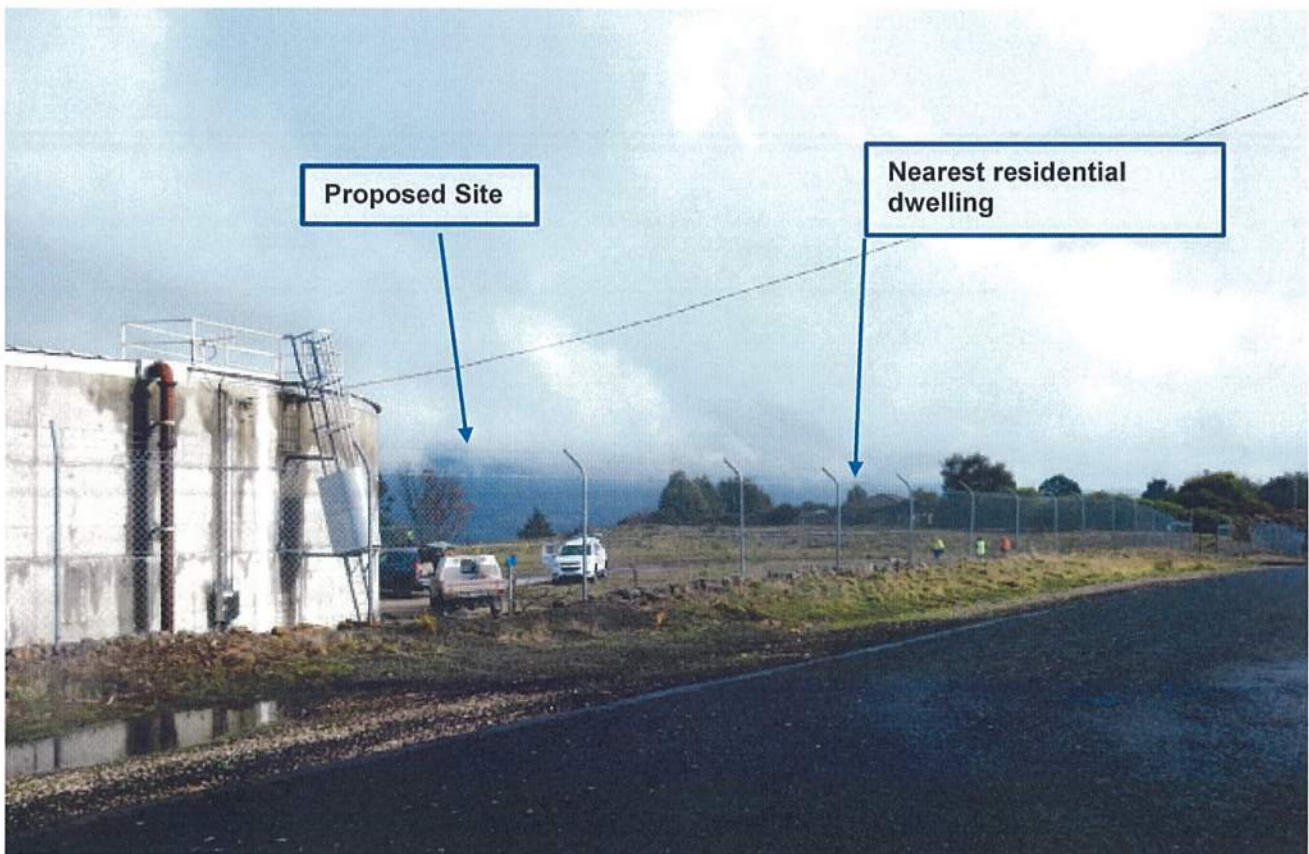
View from Preservation Drive (Approx. 390m North West of proposed facility)
